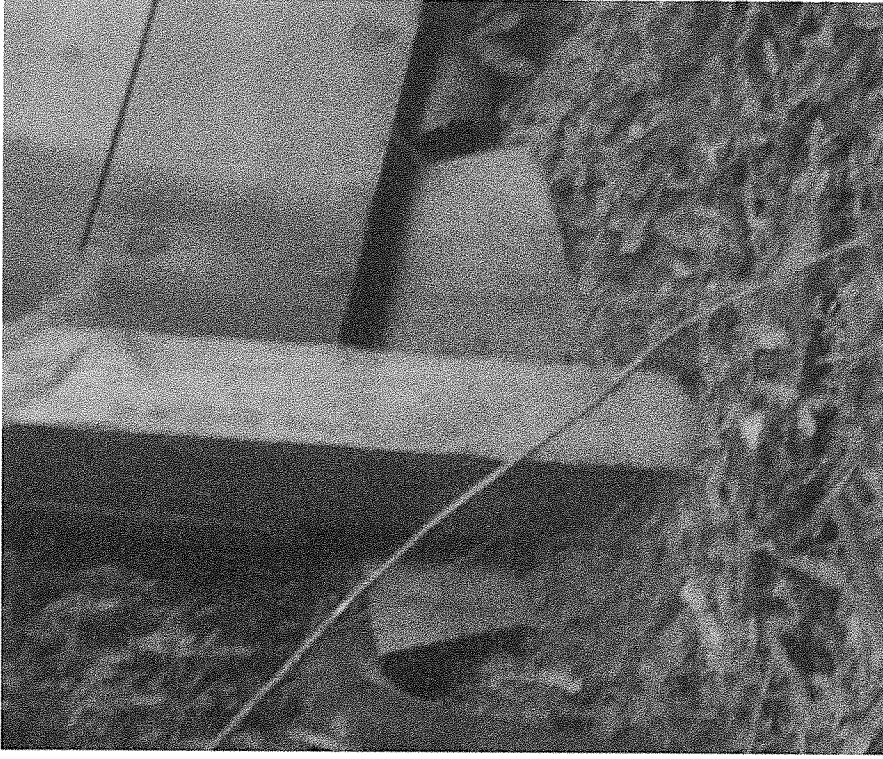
Compromised base of wall. Note exposed drainage pipe. Photo 4: Retaining wall with driveway above.
